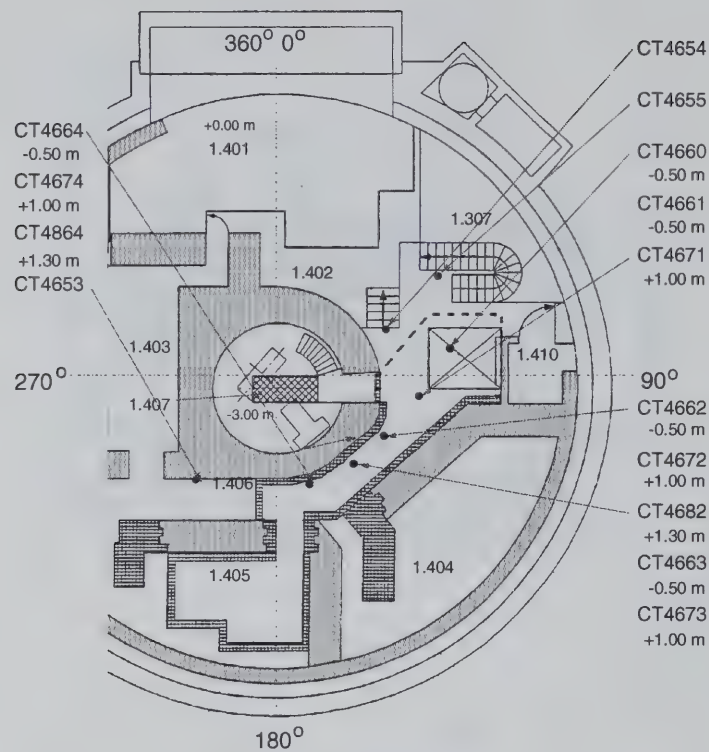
Level 1.400 TC's at the +0.0 m Elevation
